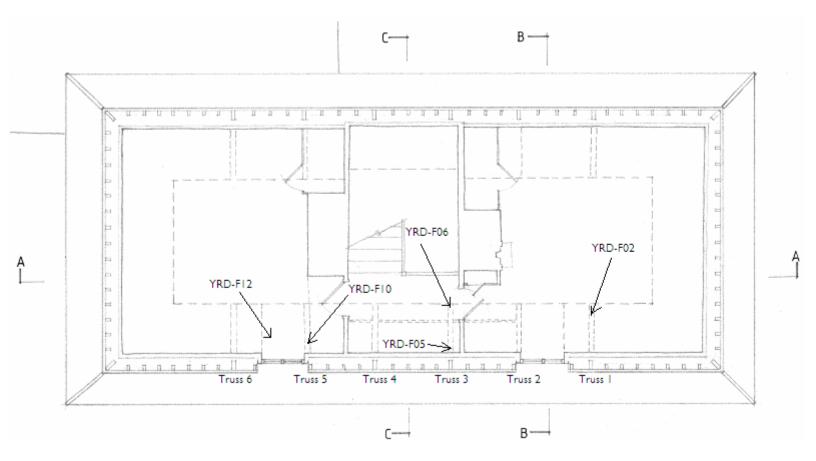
Yarde Farmhouse; South range, second floor plan, showing truss position and the location of samples YRD-F02, YRD-F05–06, YRD-F10, and YRD-F12 (Architecton)
